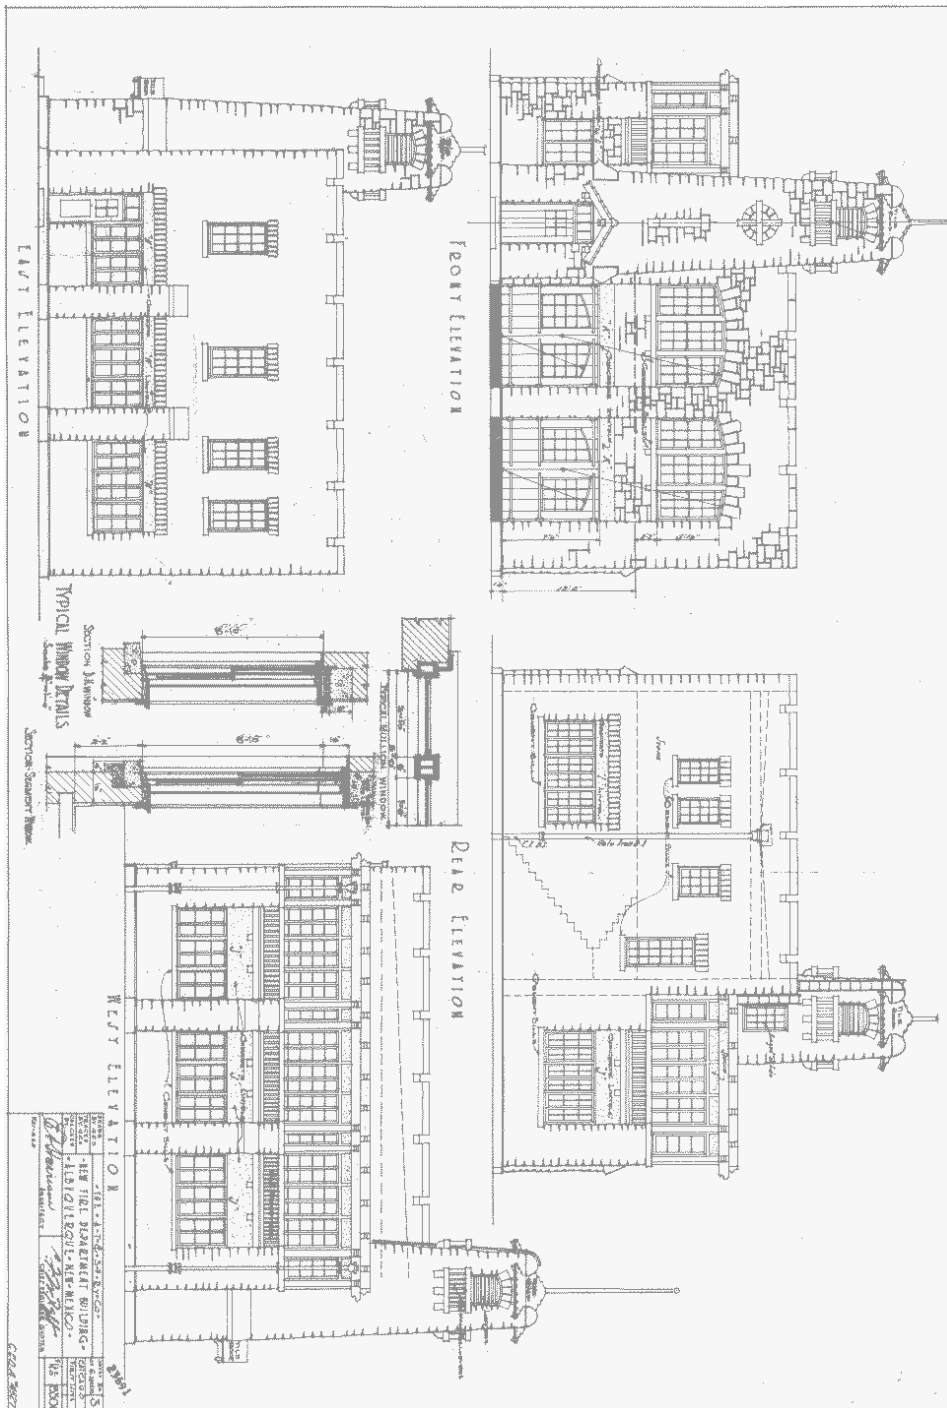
Construction drawing of fire station showing elevations. AT&SF Engineers, drawing c.1919
